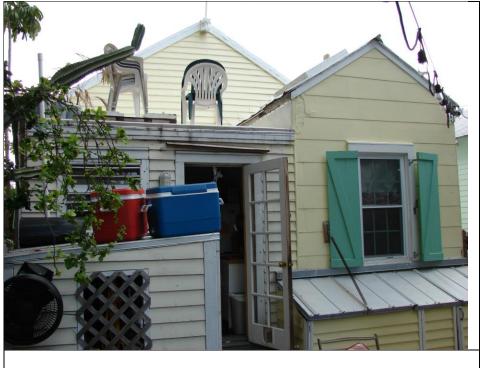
1404 Olivia House: Sheds to be Rebuilt
